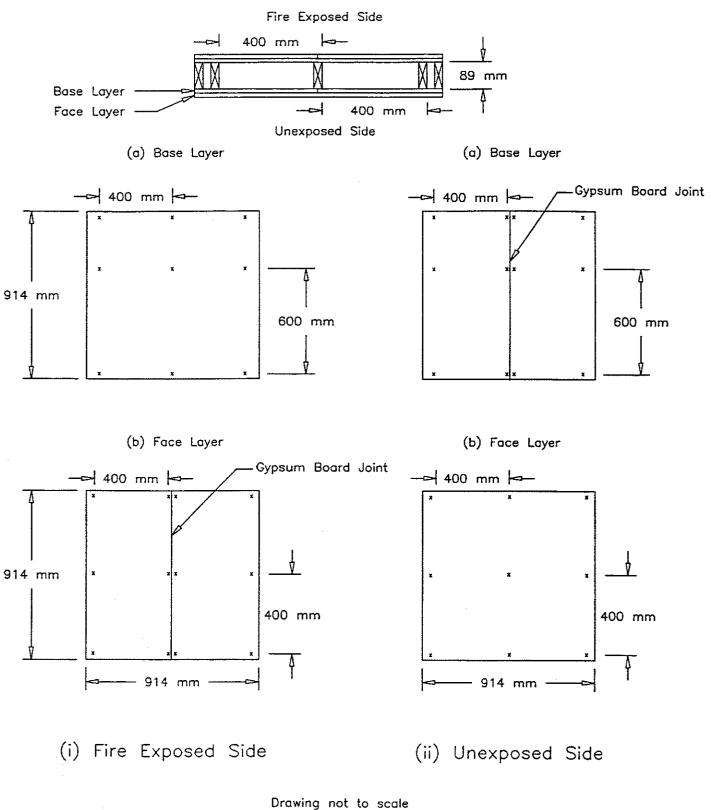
Screw Locations for 400 mm O.C. Wood Stud, 1x2 Regular Gypsum Board Layers, Small-Scale Assembly S-49
